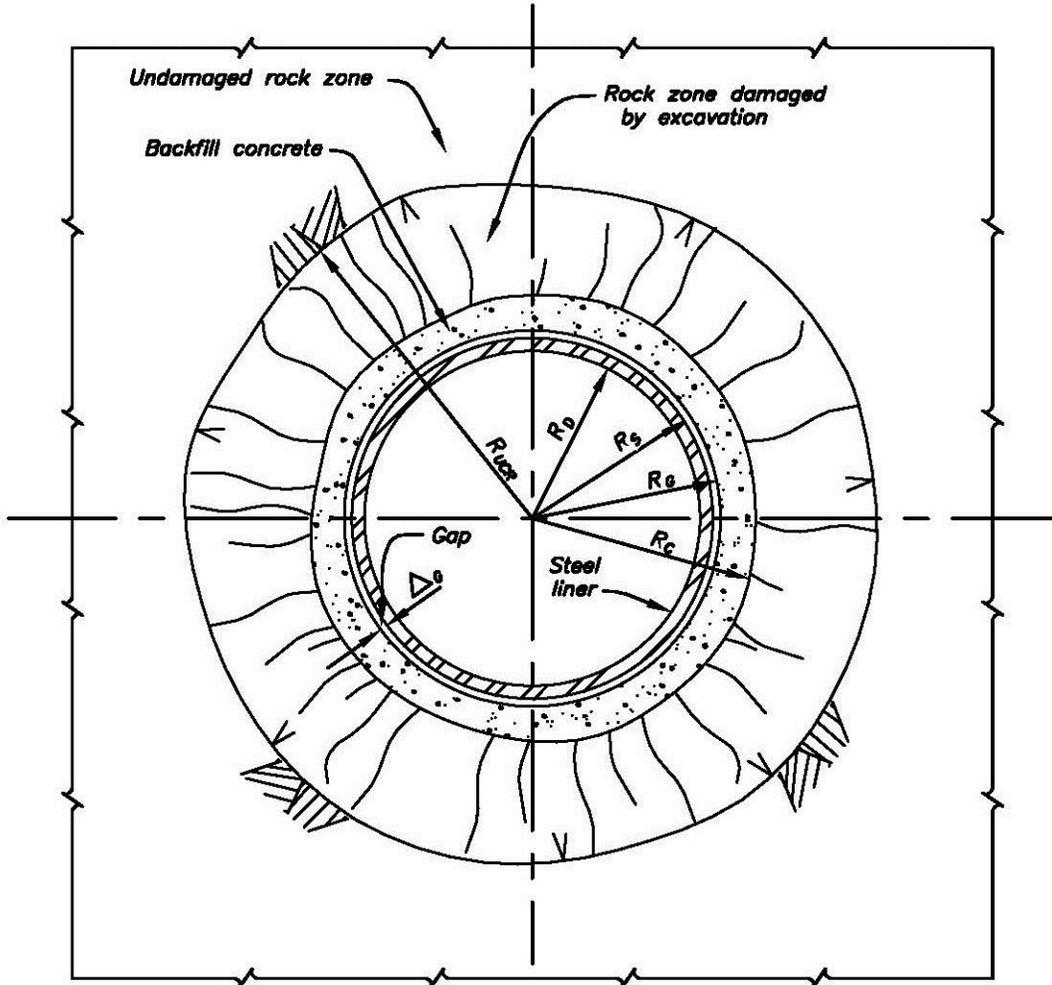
Load sharing between steel liner, backfill concrete, and surrounding rock.
